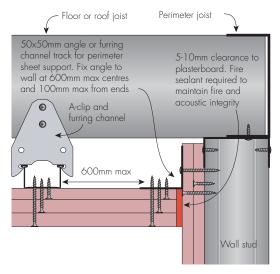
Fire Rated Ceiling to Wall A-clip and furring channel
